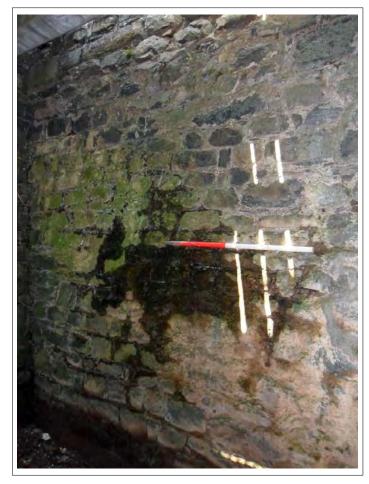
Oblique view of north wall of drawbridge pit, looking north west, Scale 1x1m
